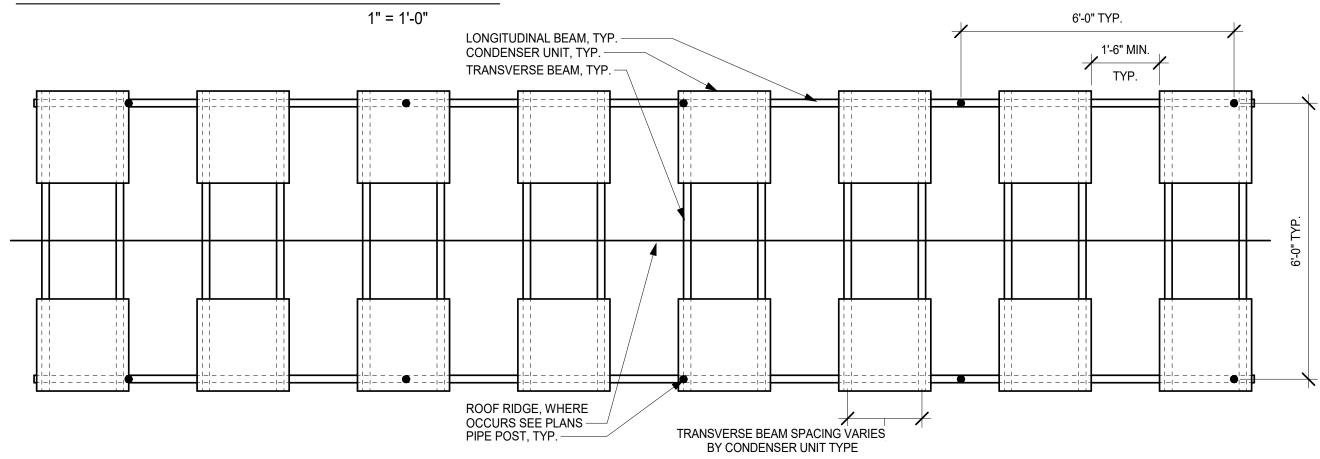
DETAILS ARE TYPICAL, MECHANICAL ROOFTOP UNITS ARE A DEFERRED PERMIT SUBMITAL
